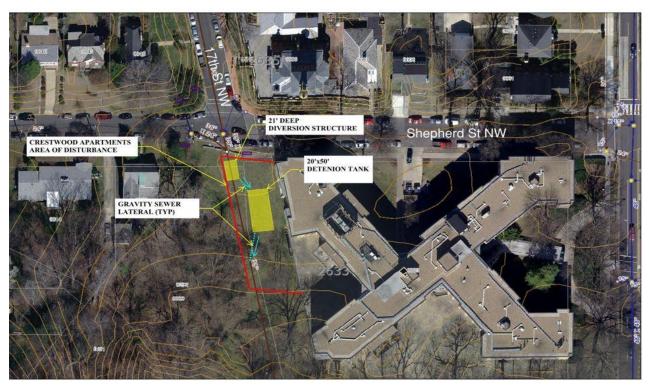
Upstream Storage Tanks with Pump Station - Storage Facility 04
